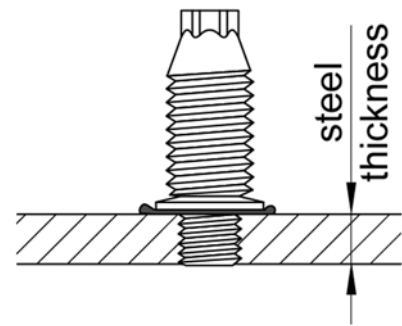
DEPICTION OF HOLE DRILLED THROUGH STEEL BASE MATERIAL
